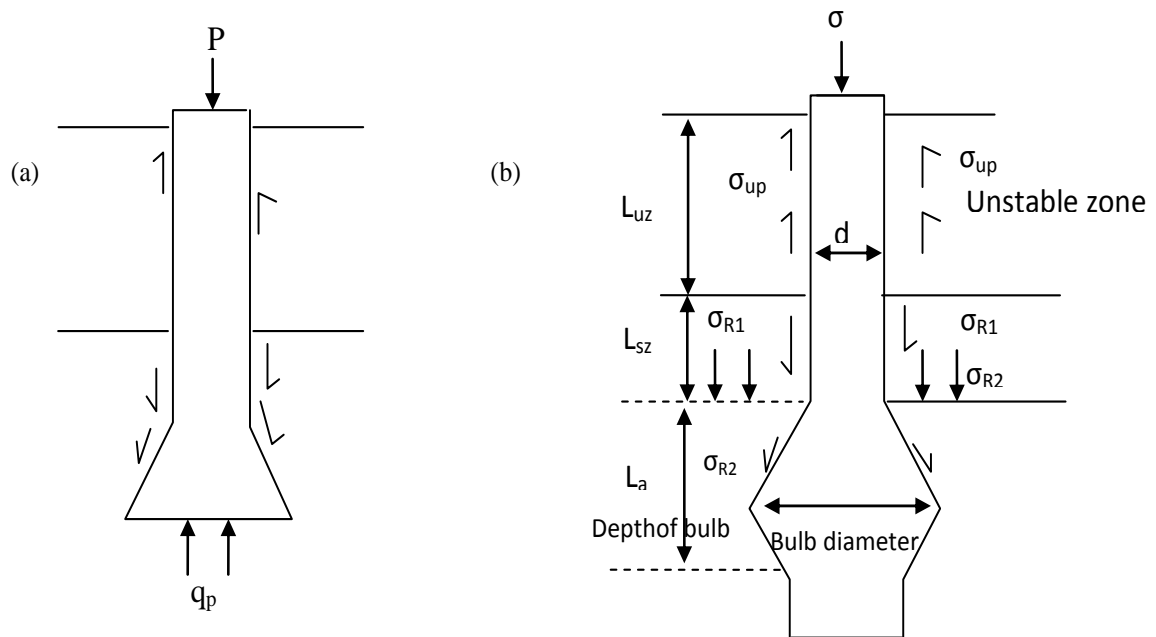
Typical single under – reamed piles for use in the expansive soil.
